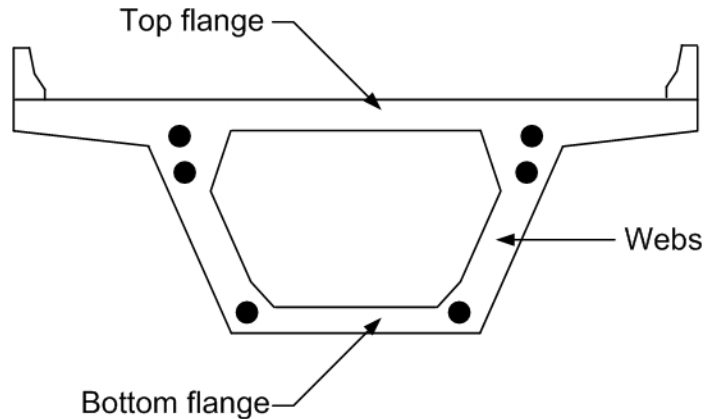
Basic Components/Elements of a Concrete Box Girder
